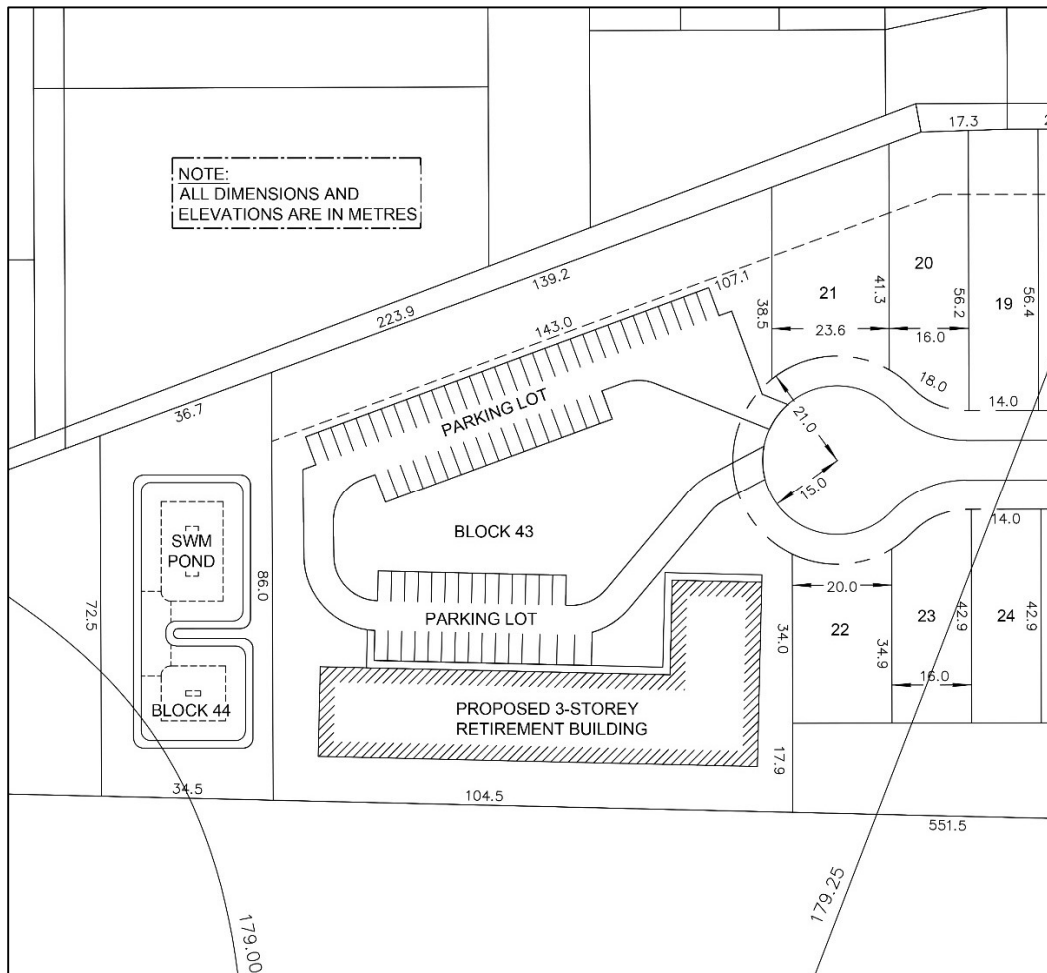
Conceptual Retirement Home Site Plan (Granite Engineering Services)
